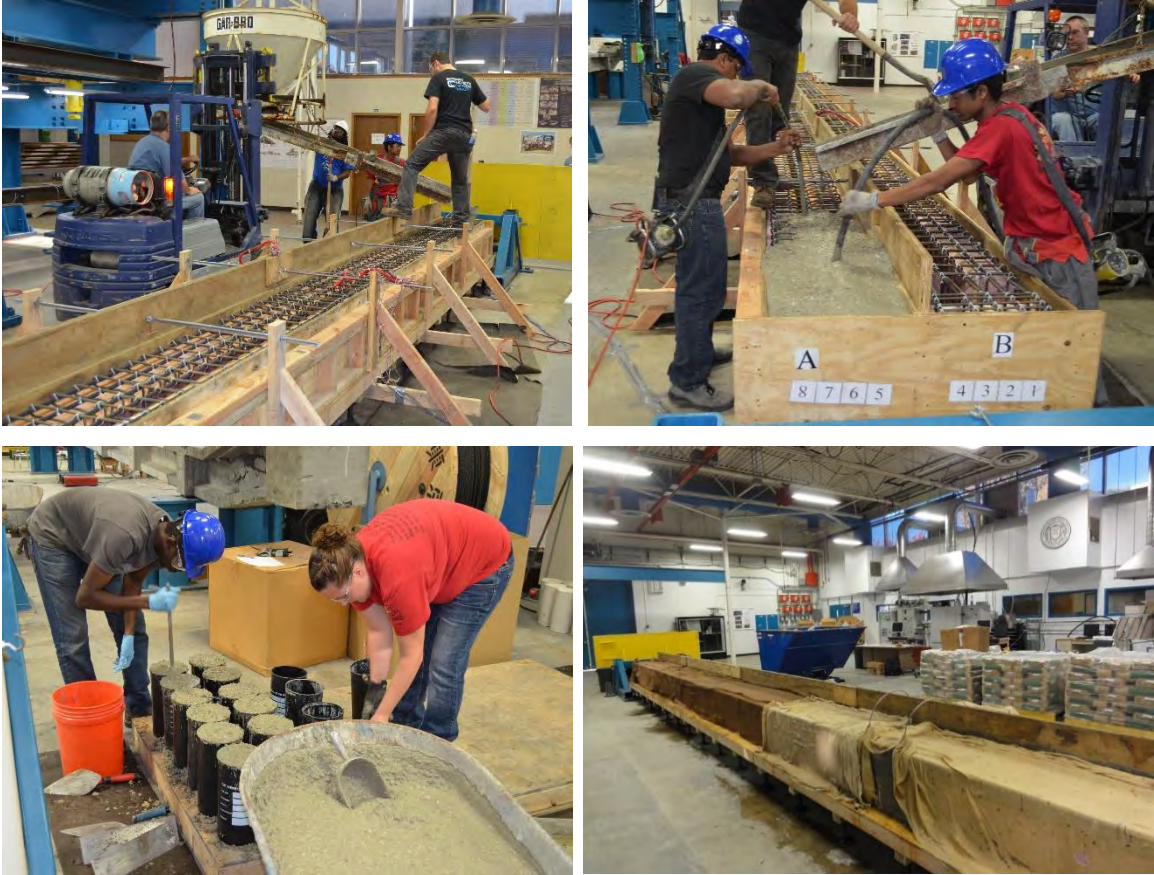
Placing and curing the concrete of the beams and cylinders
